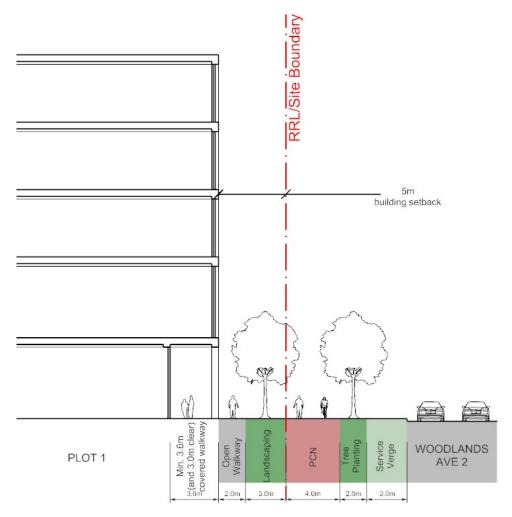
Section showing 5.0m building setback area within Plot 1 along Woodlands Avenue 2 and Woodlands Avenue 5
